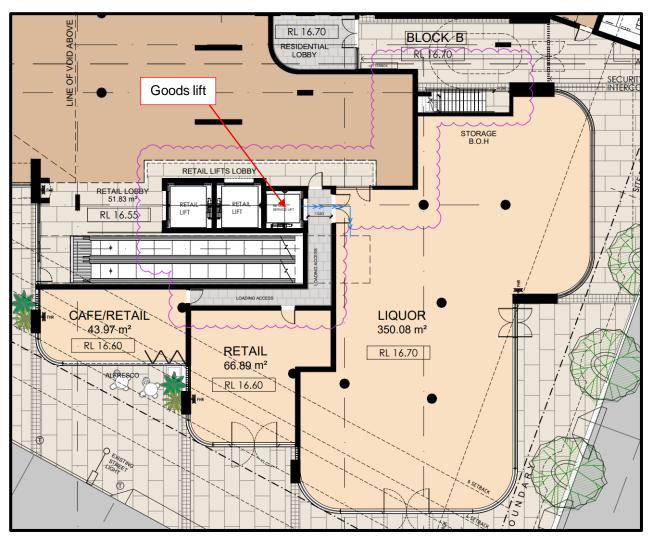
Block B – Ground Floor: goods lift to Basement Level 1
